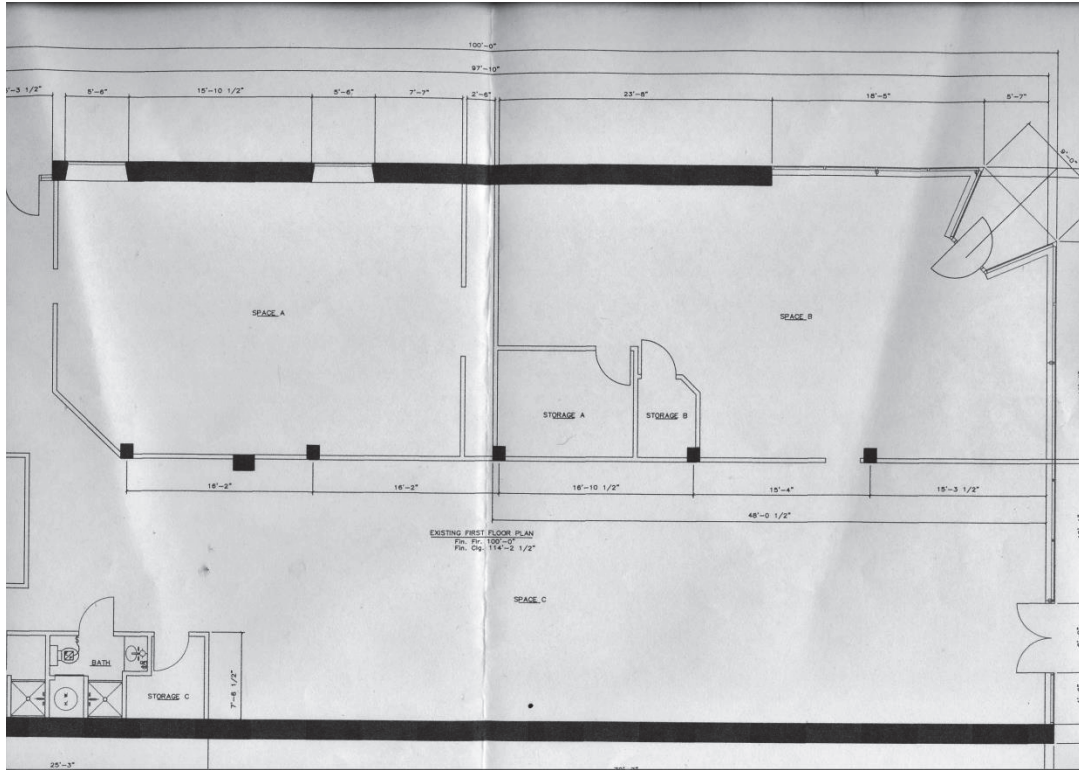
Architectural floor plan of interior of Smith Building prepared by architect Clyde Schroeder, Colorado License No. 201386 for previous owner Tom Doerk in 2014. North is top. Partition dividing north from south areas of building along south and west borders of Space A was demolished in 2014 to accommodate stage in Space A. Space B is currently retail commercial use; Space C is gallery and performance use. To scale.
